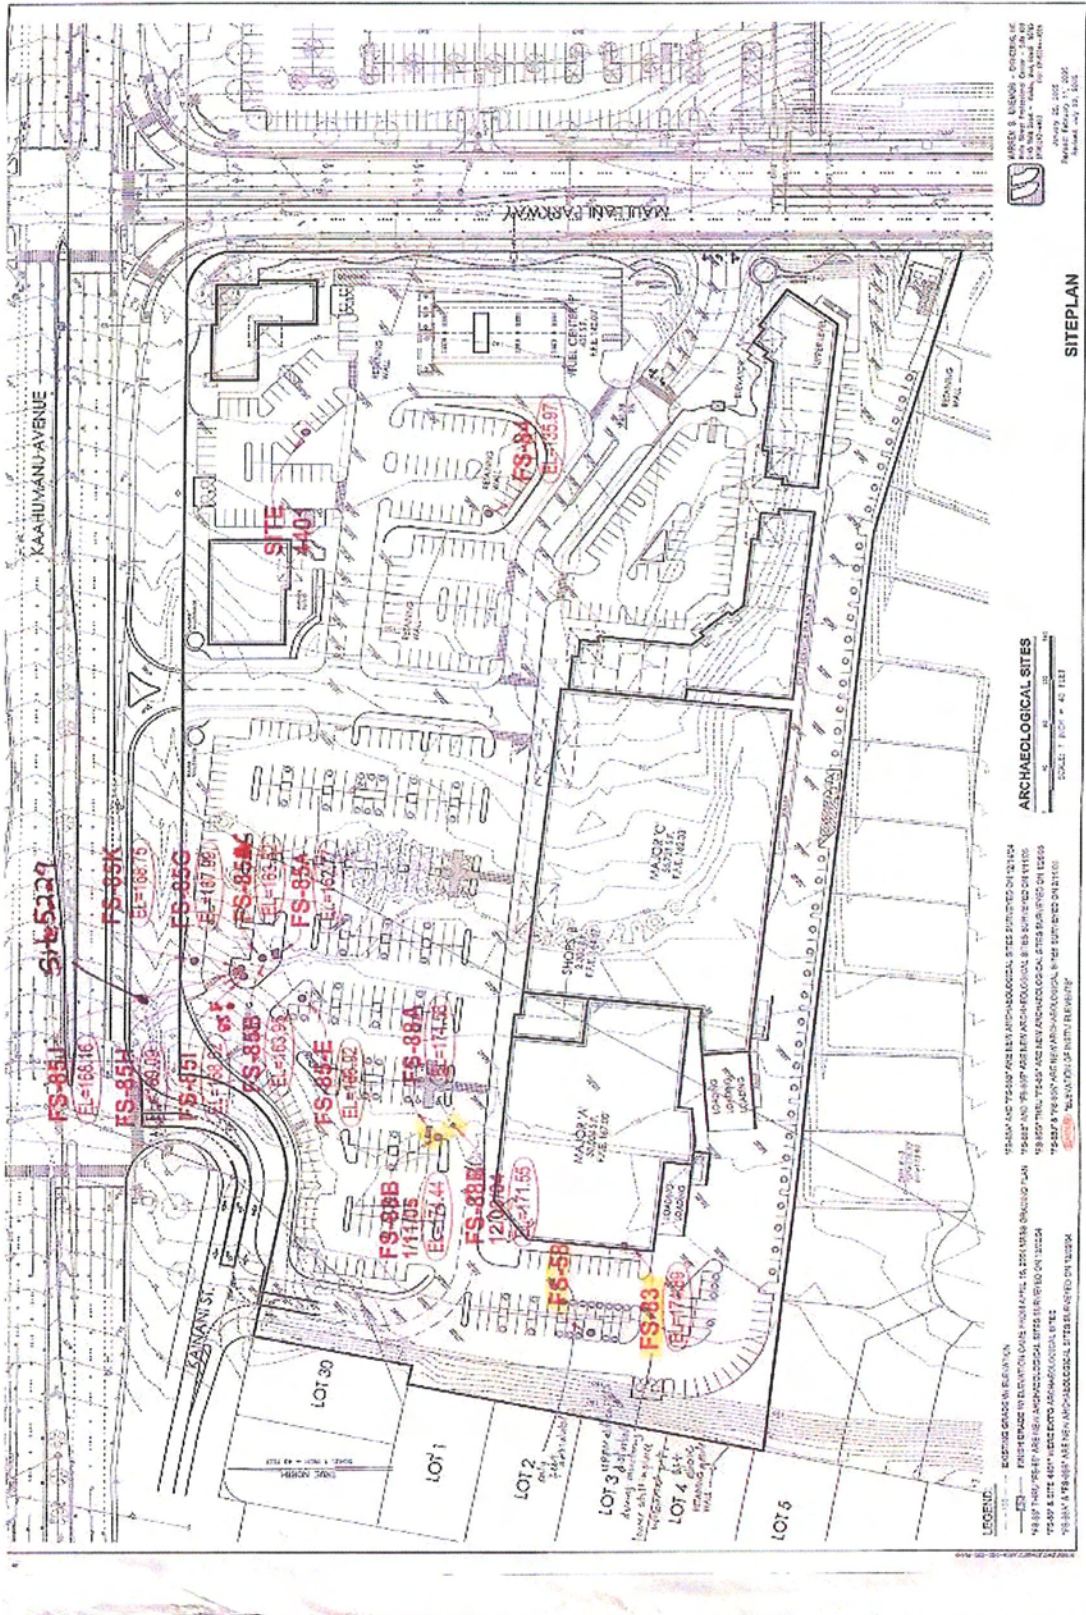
Plan View Map of Project Area (2005 Proposed Commercial Site Plan)
